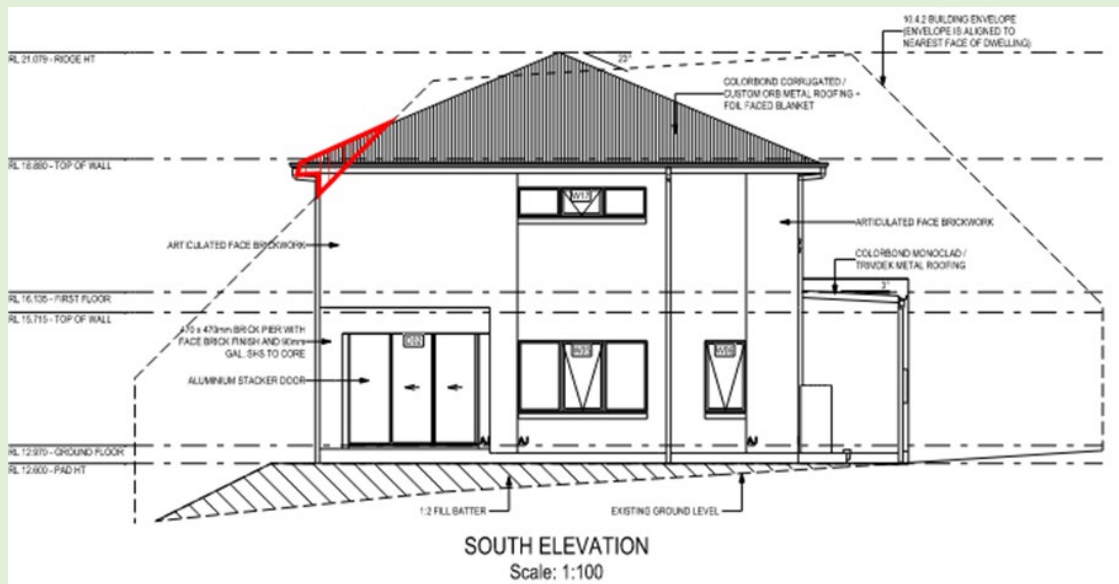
South elevation showing the extent of the west wall outside of the envelope in red hatching.
